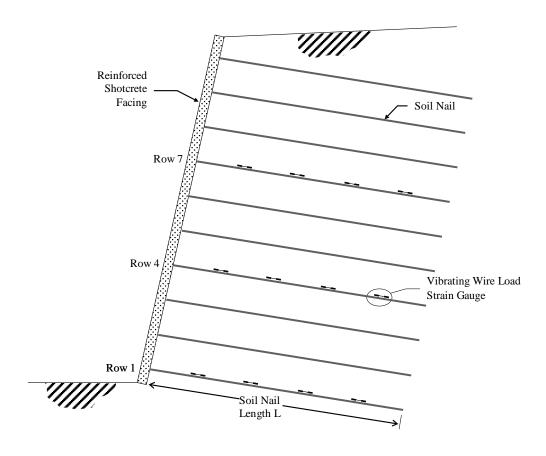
/E.1 – Typical Soil Nail Structure with Instrumentation
